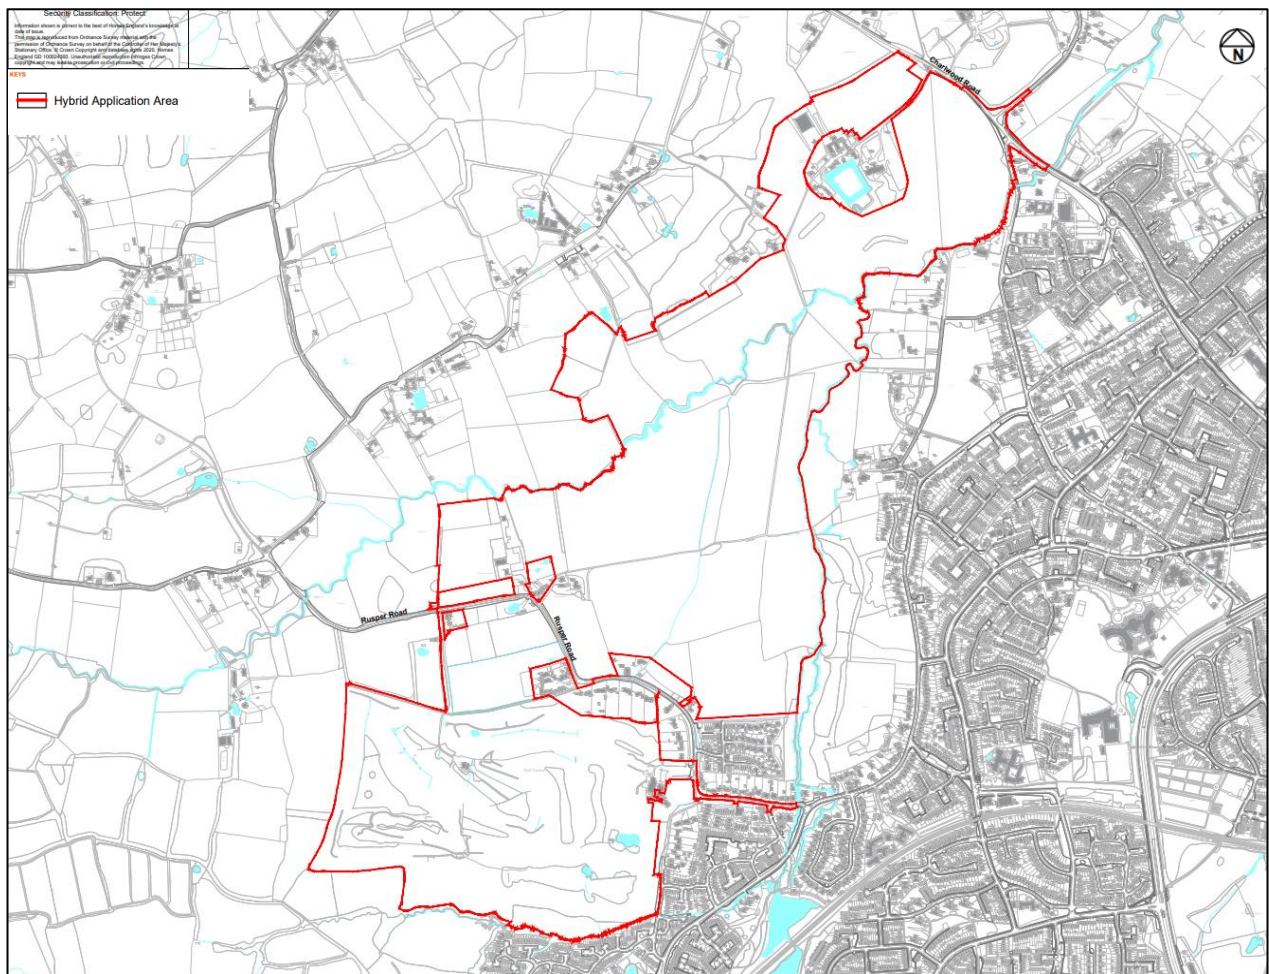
Site Location Plan (WOI-HPA-PLAN-LOC-01)
